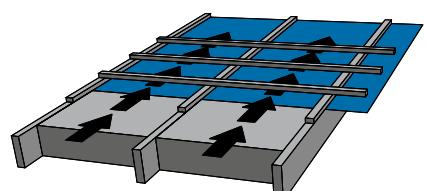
Cross-section of layers and manner of ventilation in a pitched roof with usable attic with standard thermal insulation system: 1. proper roof covering, 2. initial covering layer – STROTEX vapour-permeable film, 3. thermal insulation, 4. vapour barrier – STROTEX, BUDFOL or EKOFOIL vapour-proof membrane, 5. gypsum board.
